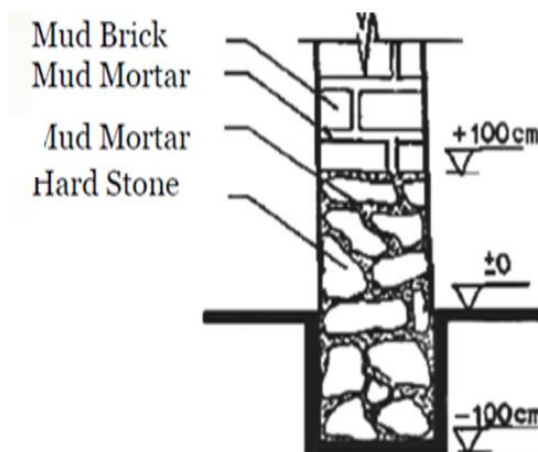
Foundation of traditional building ((Report of Ghadames Libya 1980)).
